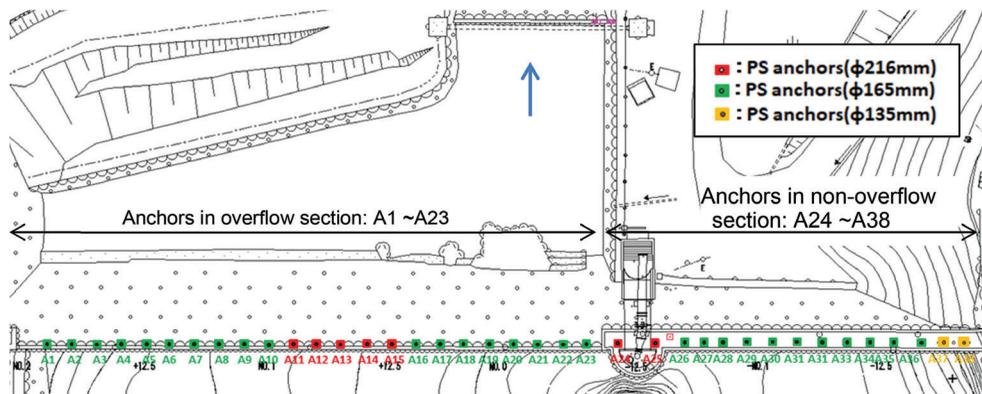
Plan view of Senbon Dam on layout of post-tensioned anchors
